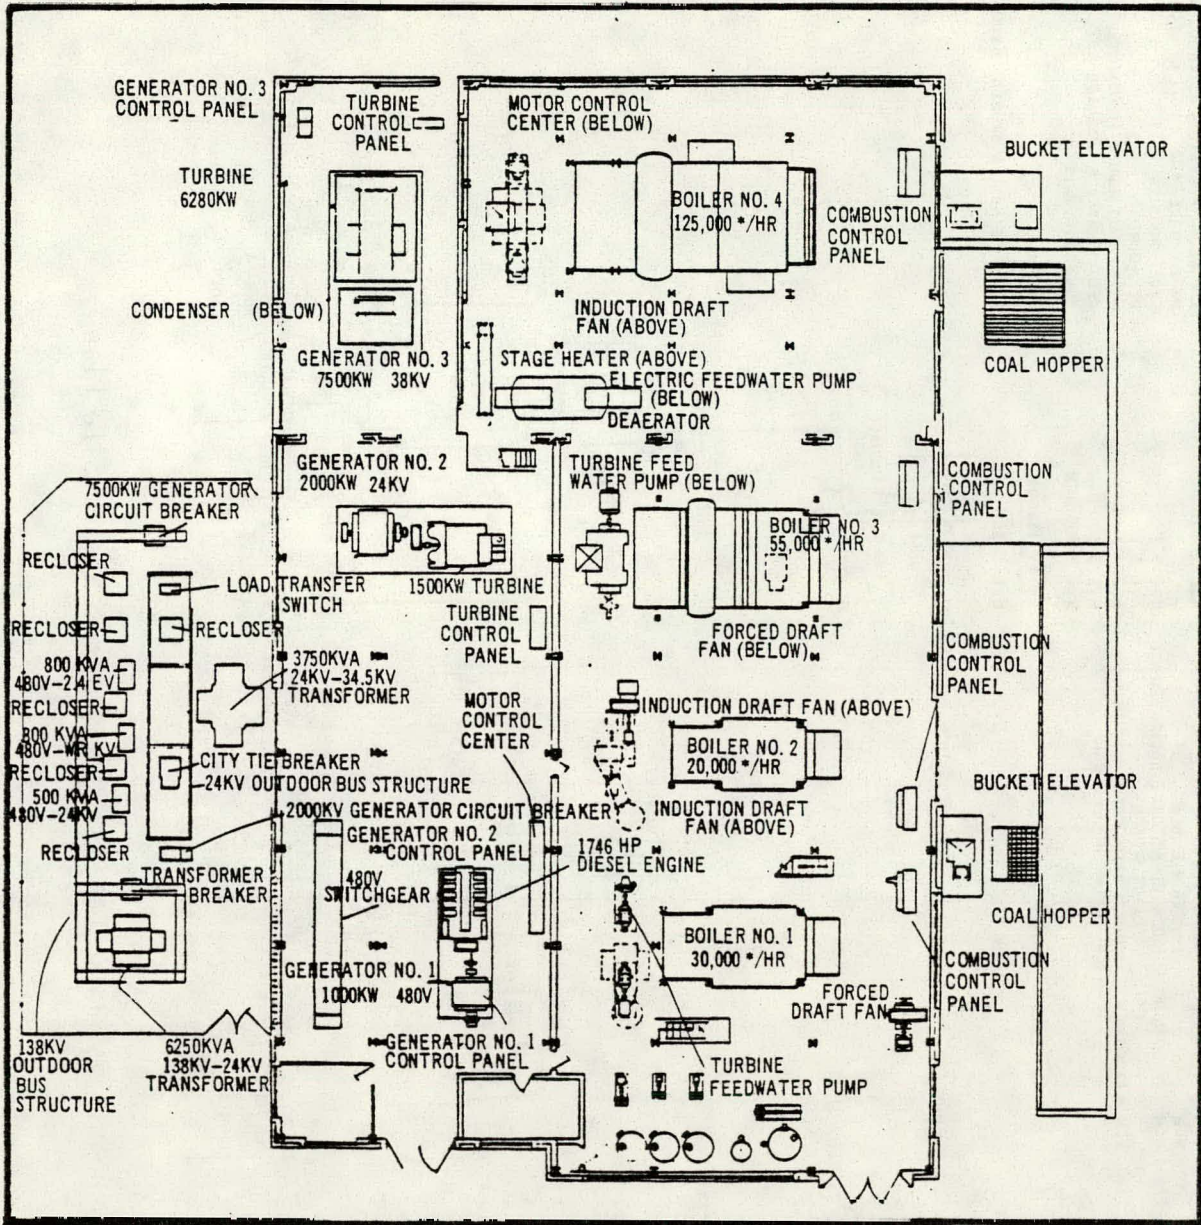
Southeast Missouri State Power Plant Floor Plan
